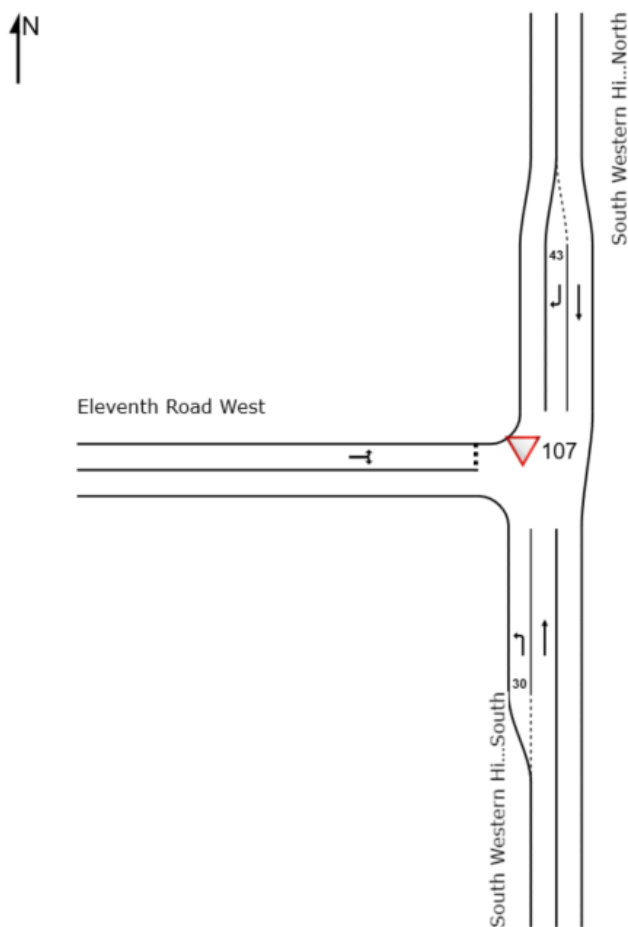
SWH/ Eleventh Road – Existing intersection layout
